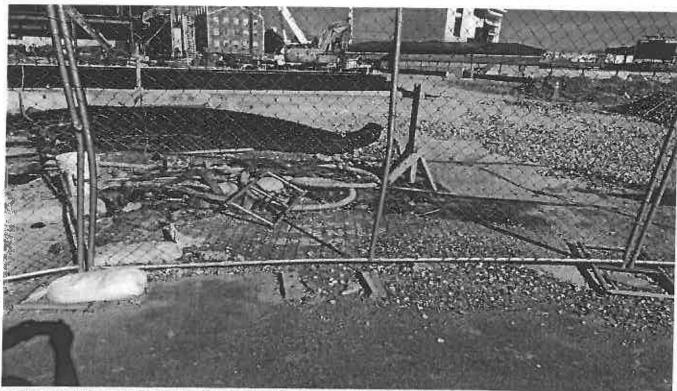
Super Silt Fence overwhelmed with pile of sediment North of the site
